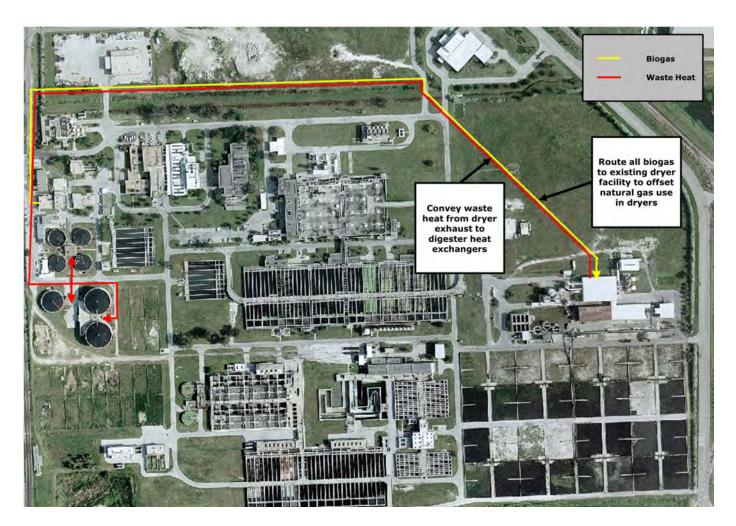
Alternative No. 5 Conceptual Level Site Plan
